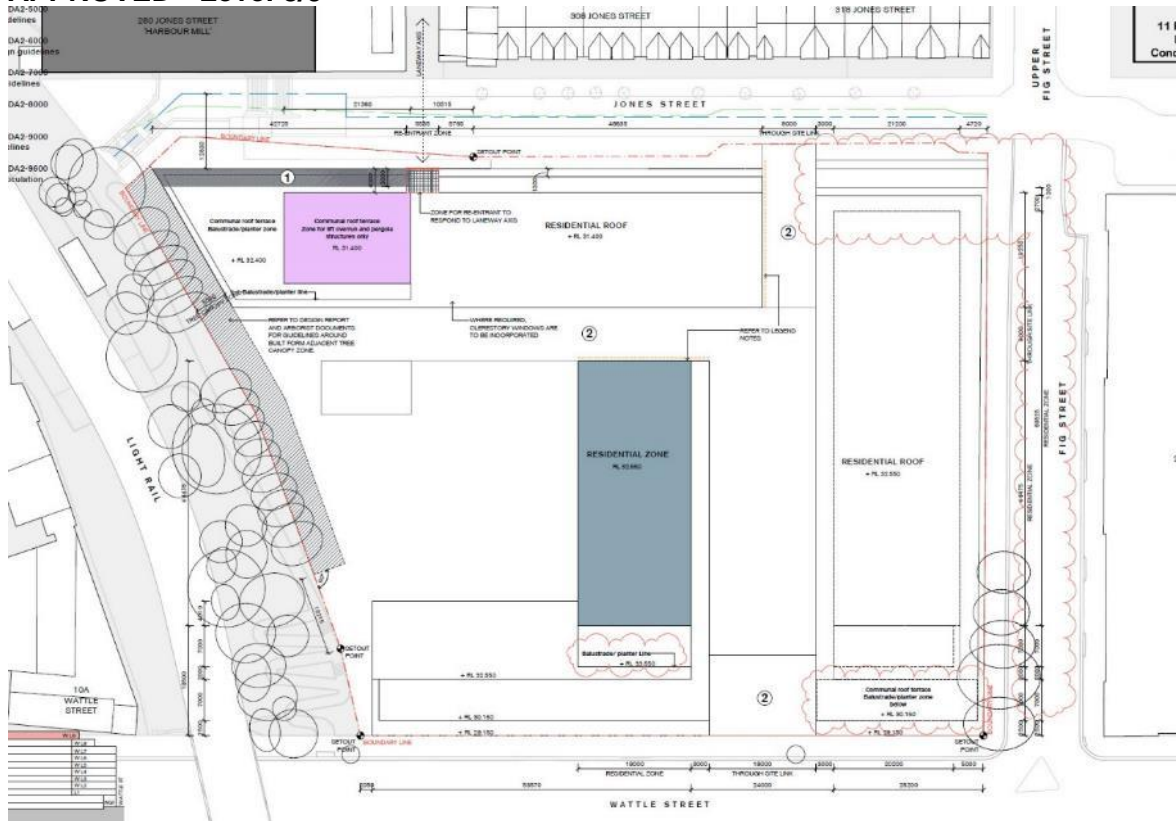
Envelope plans: Approved Level 7/8 and proposed Level 08/09
